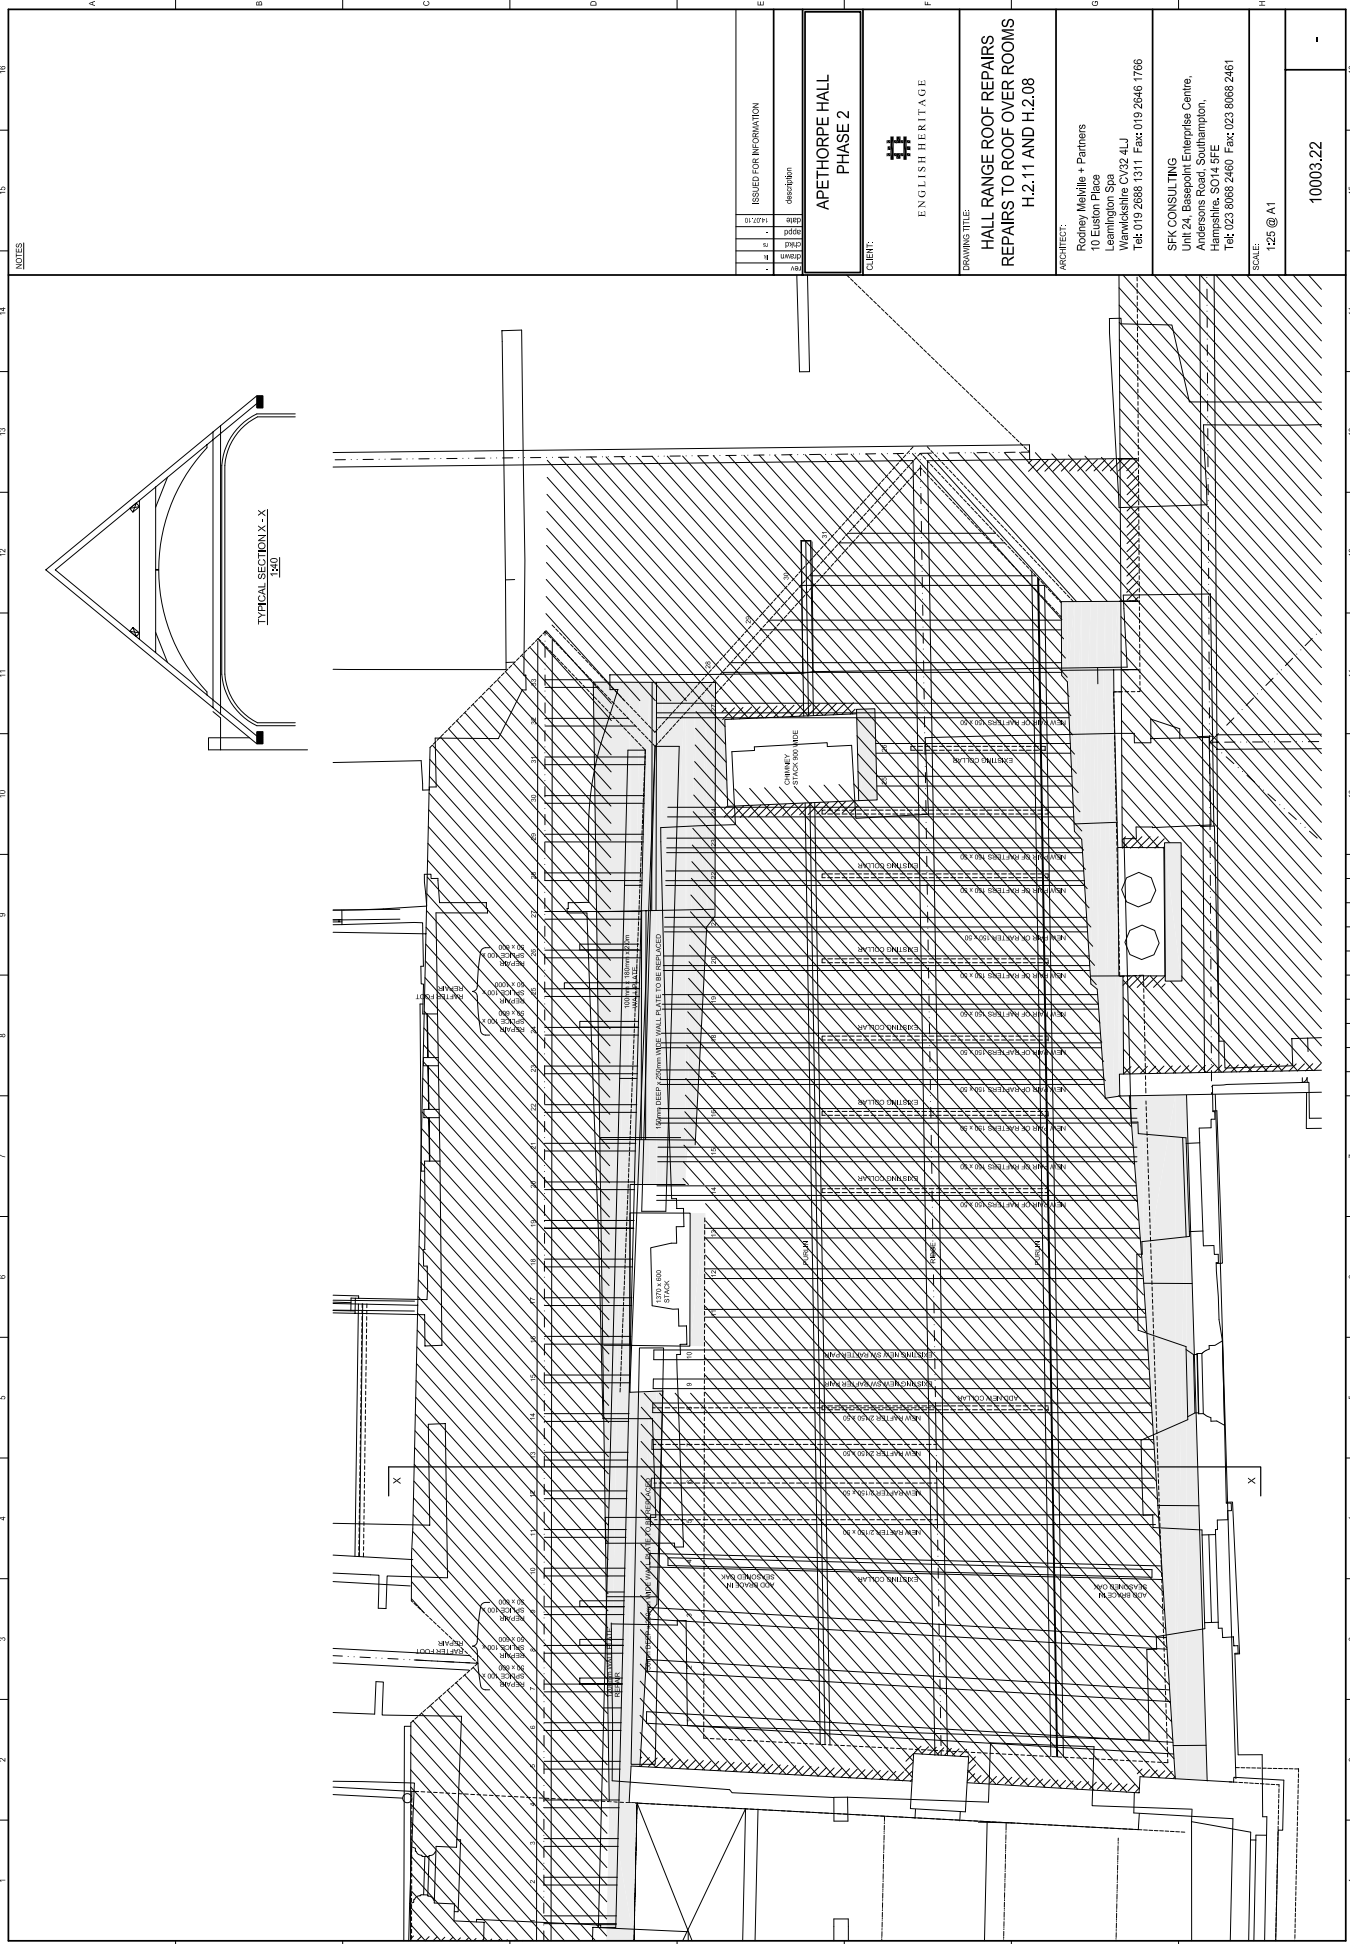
Plan of Hall Range roof repairs to roof over rooms H2.11 and H2.08' (Rodney Melville Architects/SFK Consulting Engineers, Ref 10003.22, 14 July 2010).
